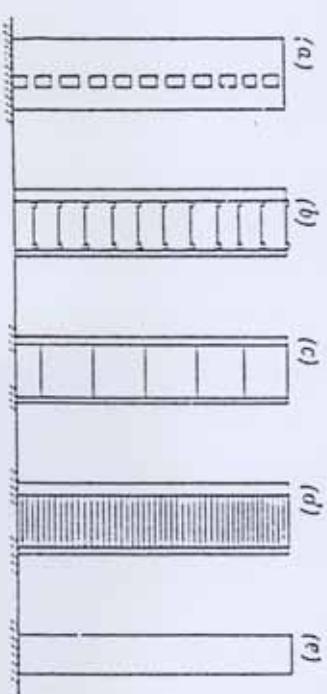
Calculation diagrams of a single-brace bearing structure of a multi-storey building
